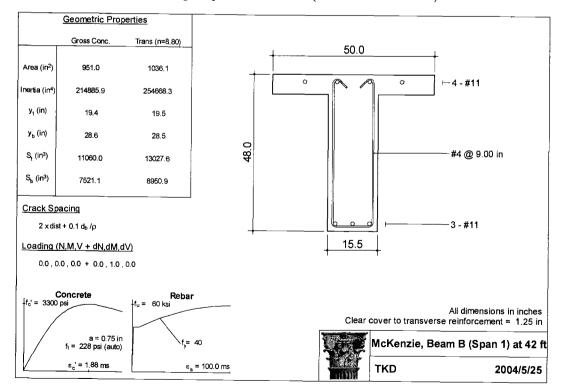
McKenzie R. Bridge; Span 1 at 42 ft. (RESPONSE 2000TM)
